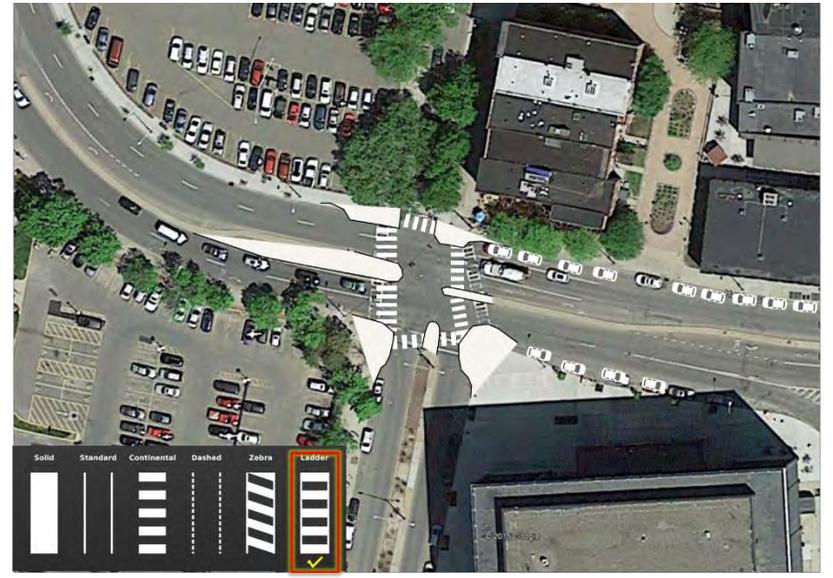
Concept: Intersection Redesign of Water and Henry Street
